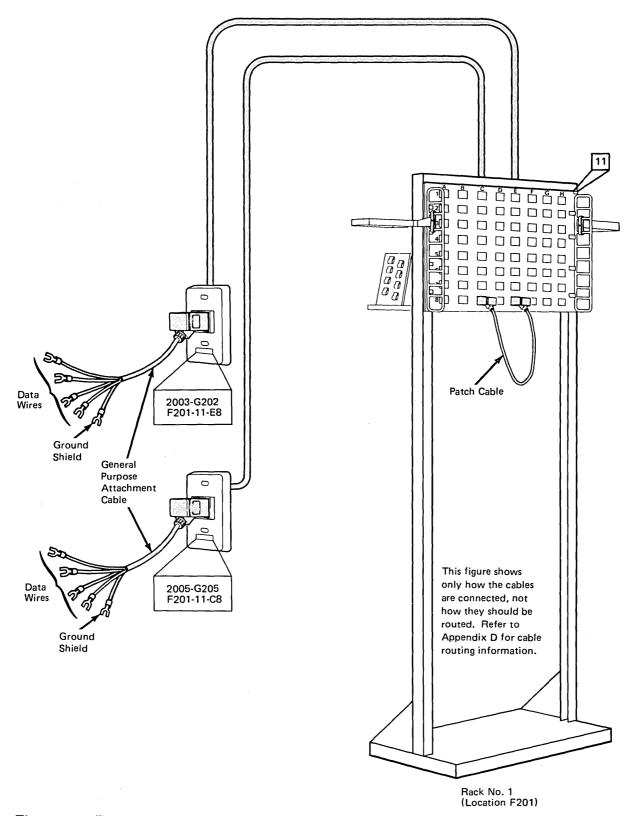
(Part 2 of 2). Example of How General Purpose Attachment Cable Is Used
